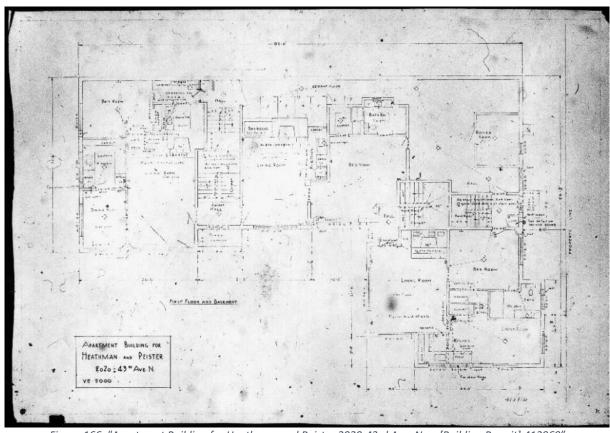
"Apartment Building for Heathman and Peister 2020-43rd Ave. N. ... [Building Permit] 412969"
